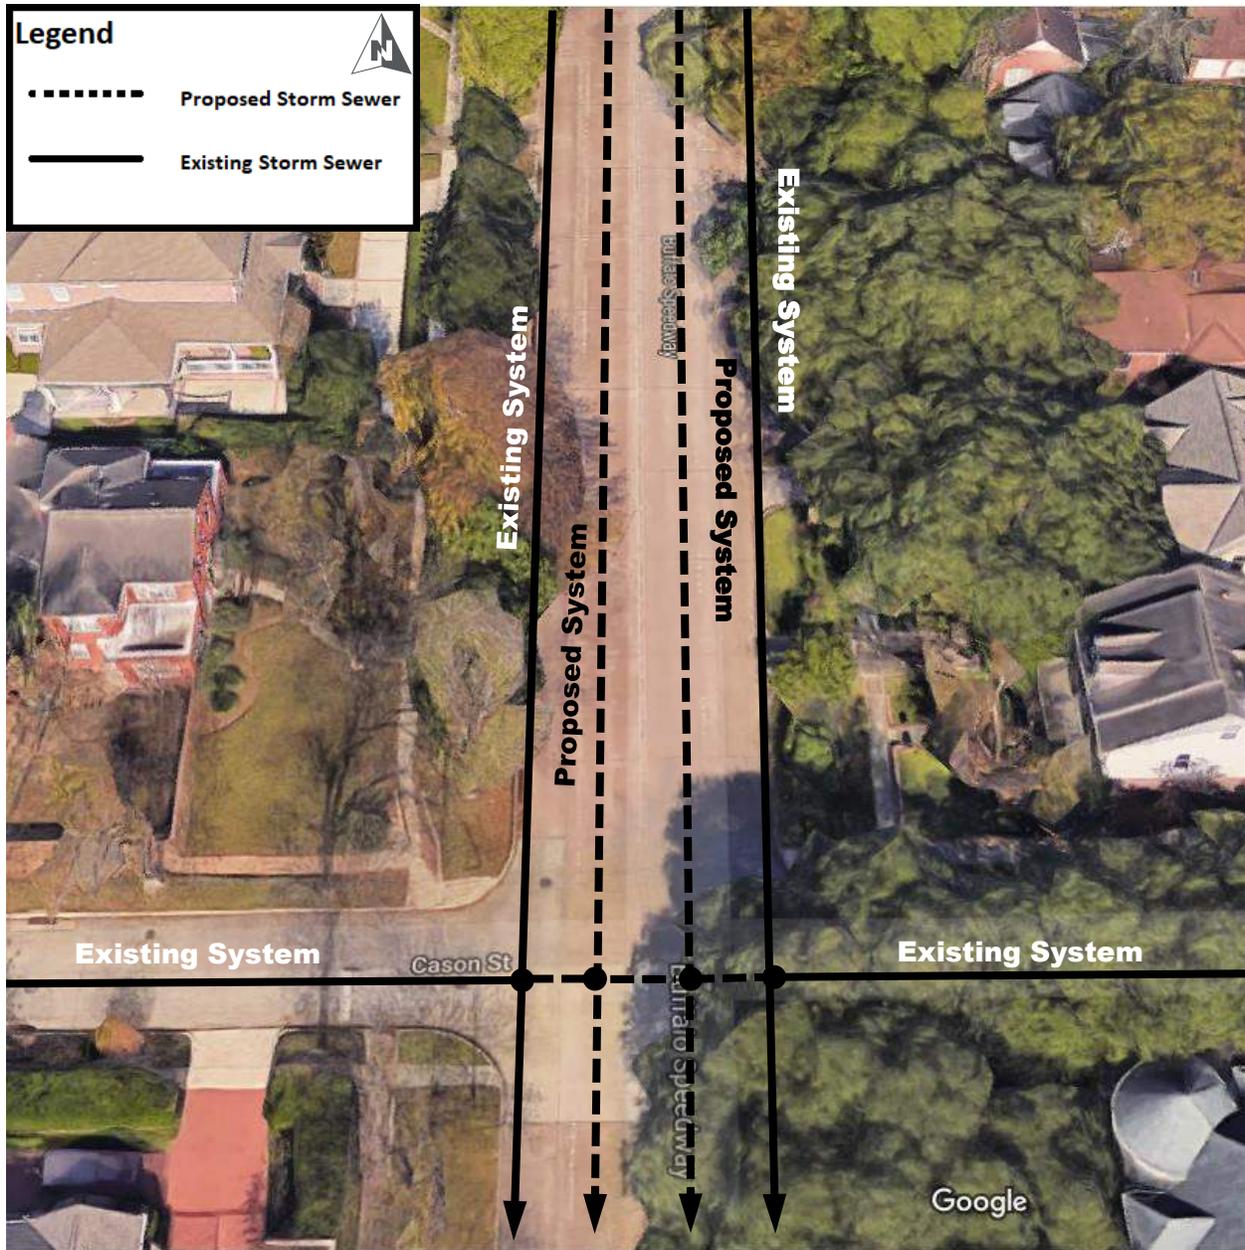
Proposed Storm Sewer Arrangement South of Amherst
